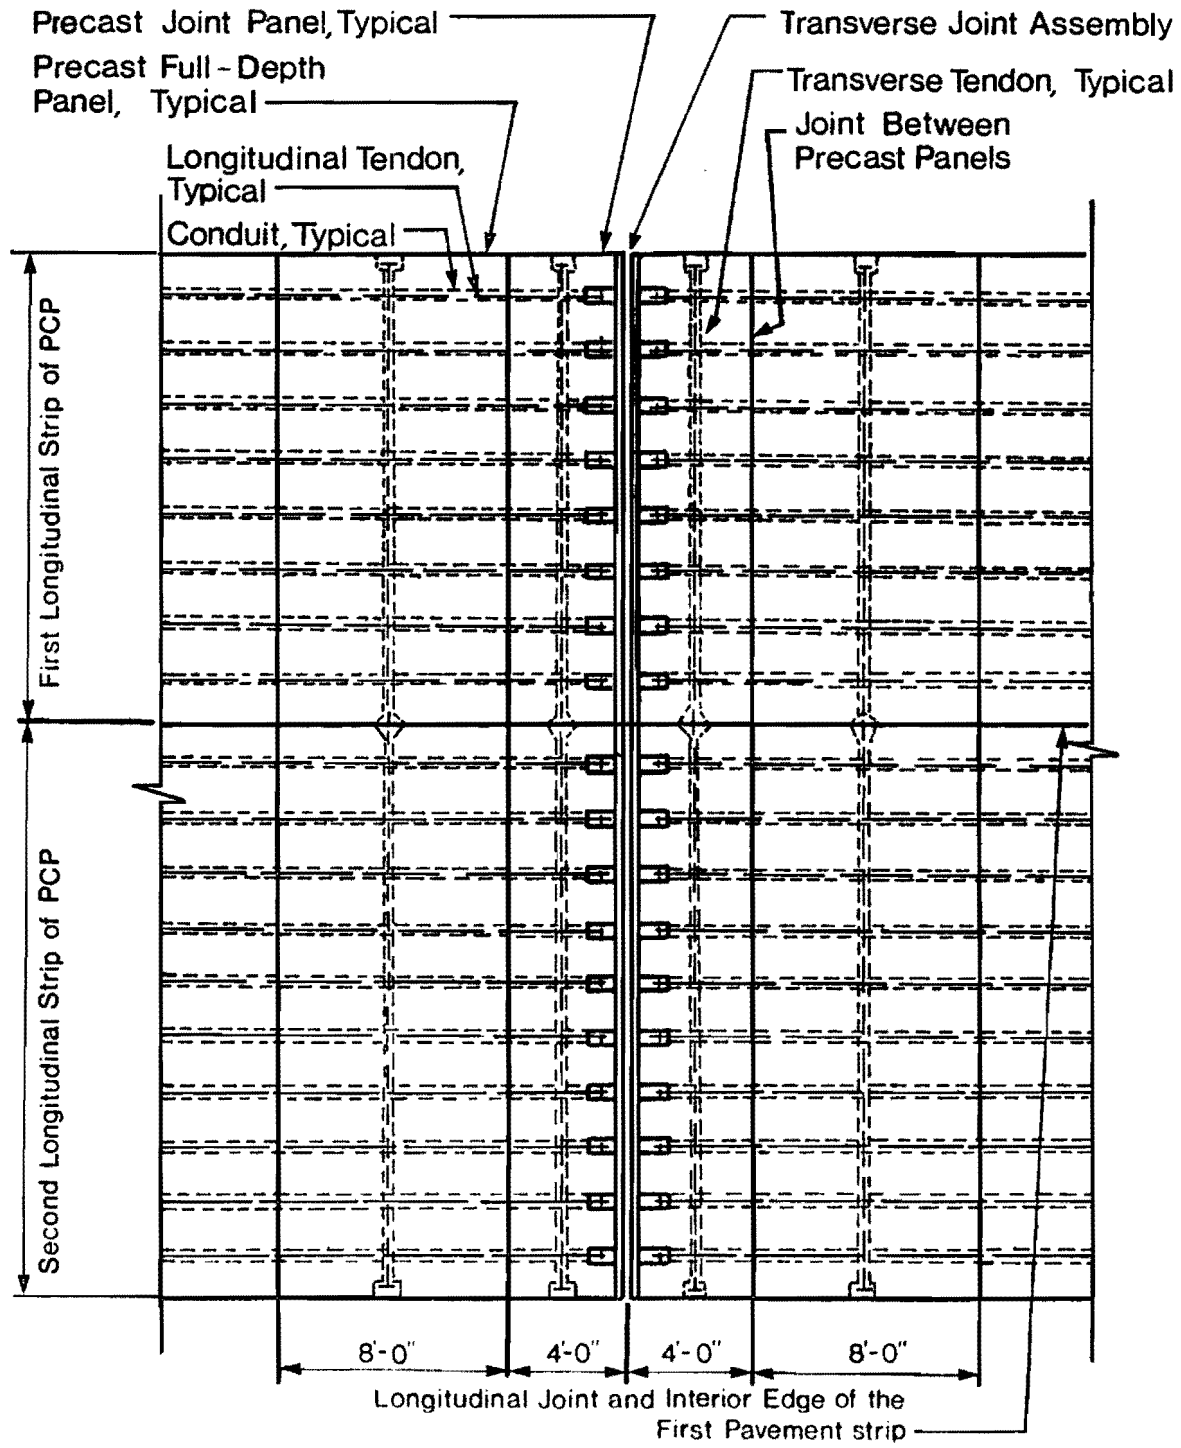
Segmentally precast prestressed concrete pavement (SPPCP).
